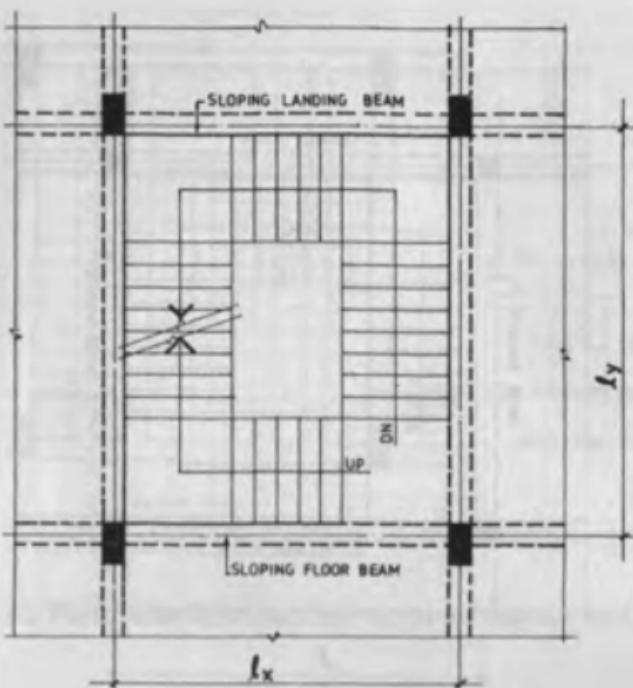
A four-flight stairs in a rectangular room in plan.
